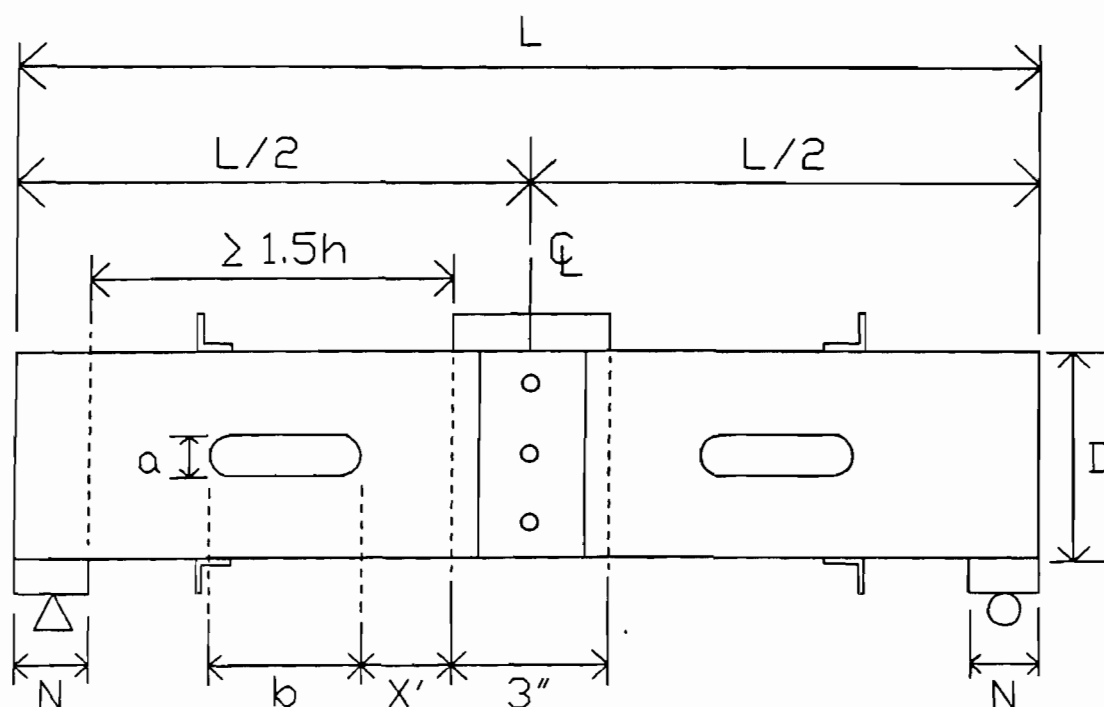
Test Setup for Combined Bending and Shear Test Specimens
